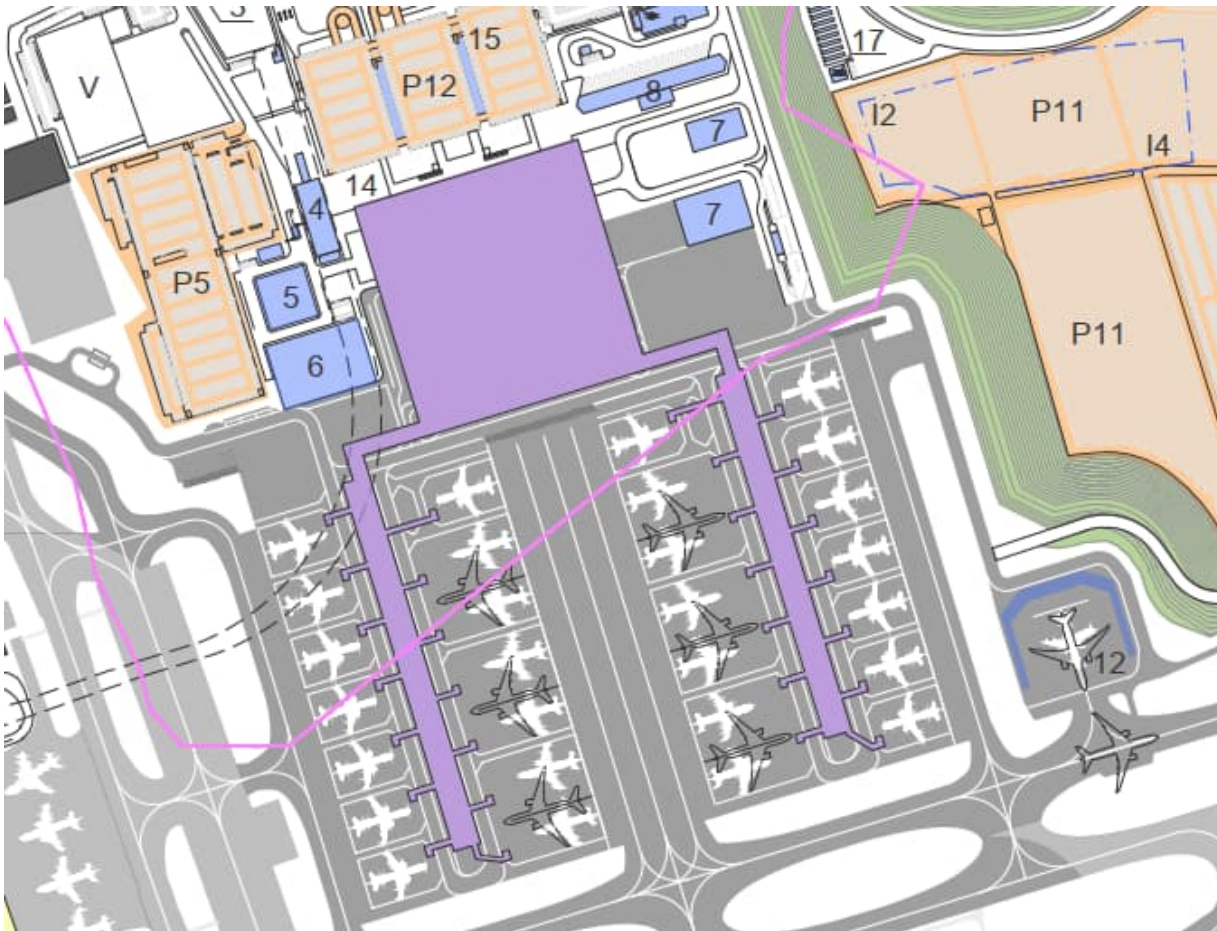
Proposed T2 Building, also showing piers and aircraft parking stands (Extract from drawing no. LLADCO-3C-CAP-WHS-GEN-DR-AR-1260)
